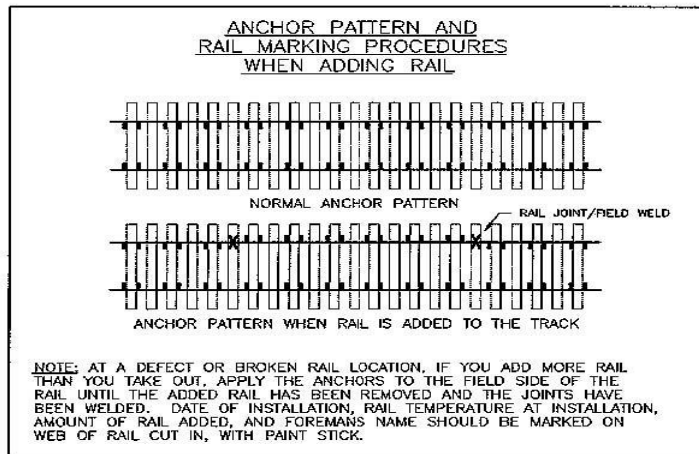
Anchor Pattern and Rail Marking When Adding Rail
